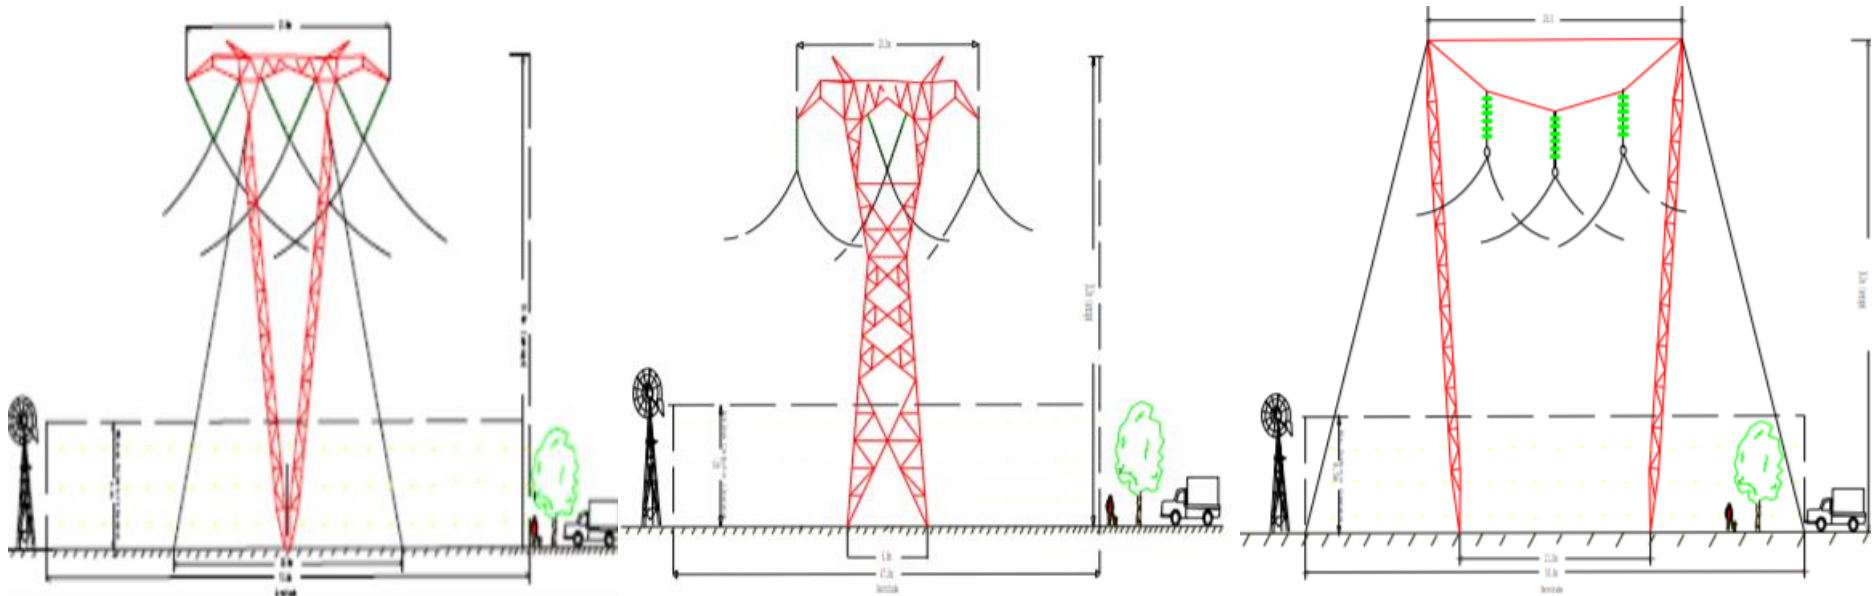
Indicative drawings of the pylon structures potentially being considered for the proposed 400 kV power line (From Left: Guyed V Towers, Strain Towers, and Cross Rope Suspension Tower (Source: Eskom, 2011)).
